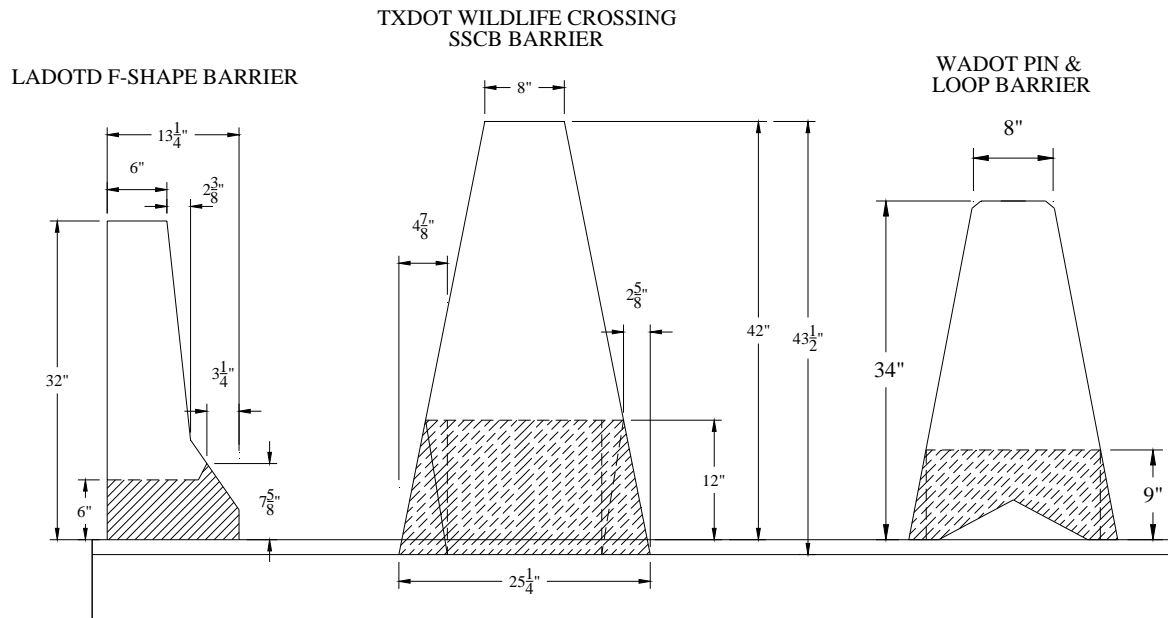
LaDOTD F-Shape Barrier, TXDOT Wildlife Crossing Barrier WSDOT Pin & Loop Barrier Cross-Sections
